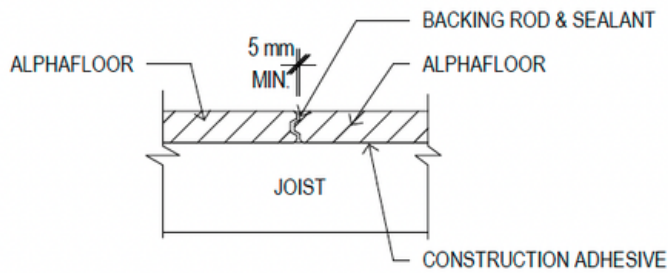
ALPHAFLOOR® FIXING AT END OF PANELS TO TIMBER JOISTS
